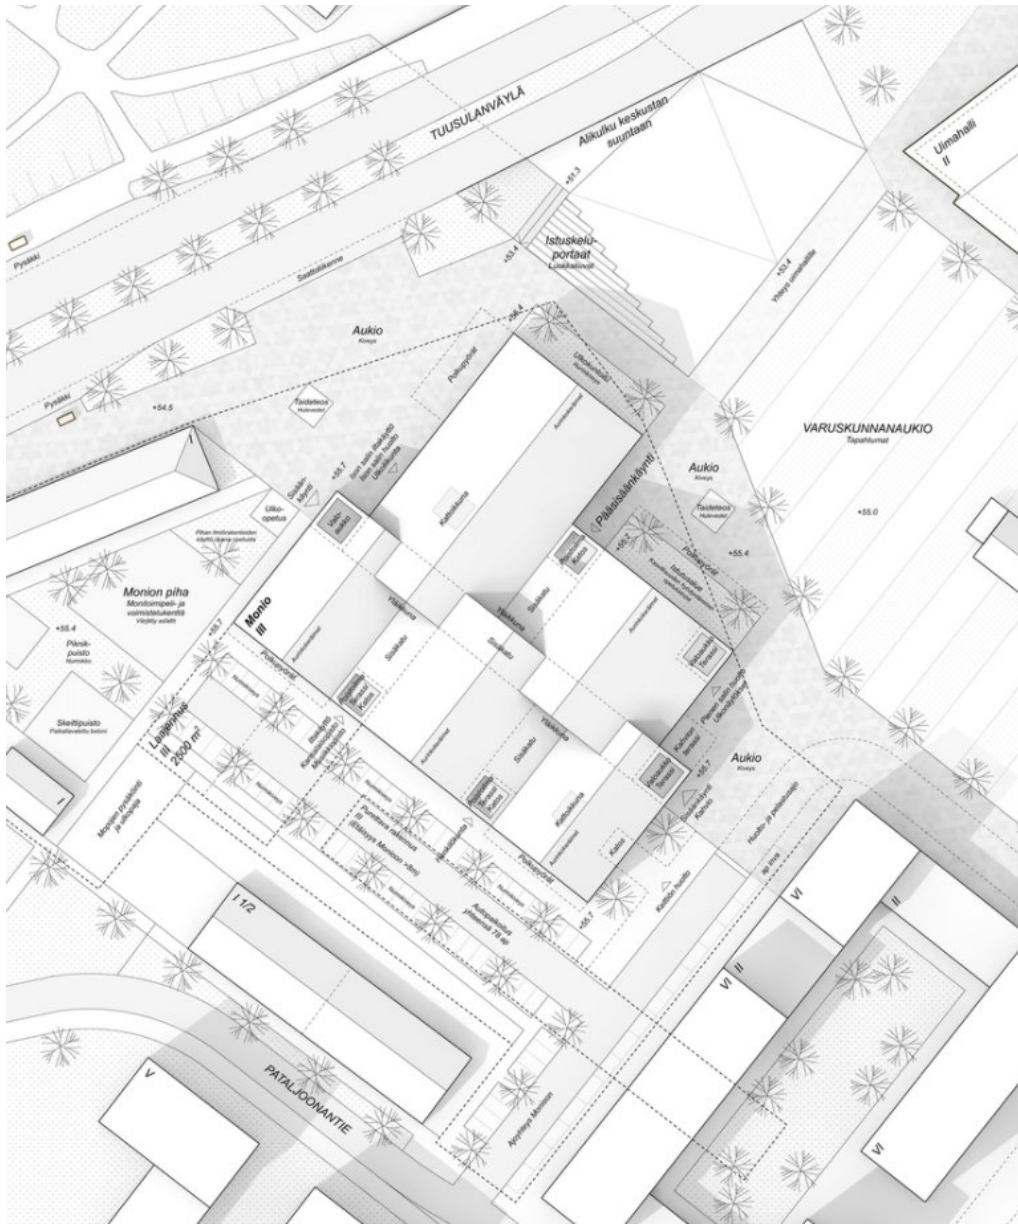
The site plan reveals the main street to the northeast intersecting the main entry, by AOR Architects, 2018, <https://www.archdaily.com/889345/high-school-and-community-centre-project-tests-the-limits-of-timber-log-construction>, Copyright 2020 AOR Architects
